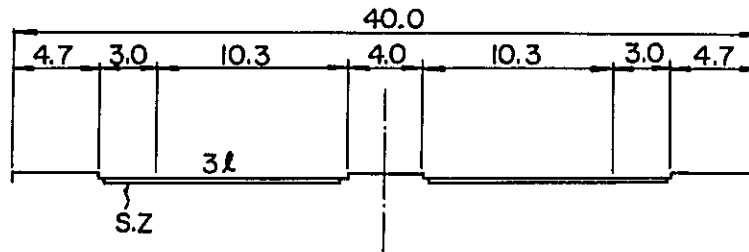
(1) ROADWAY SECTION OF TAYABAS ST. (2-WAY PLAN)
